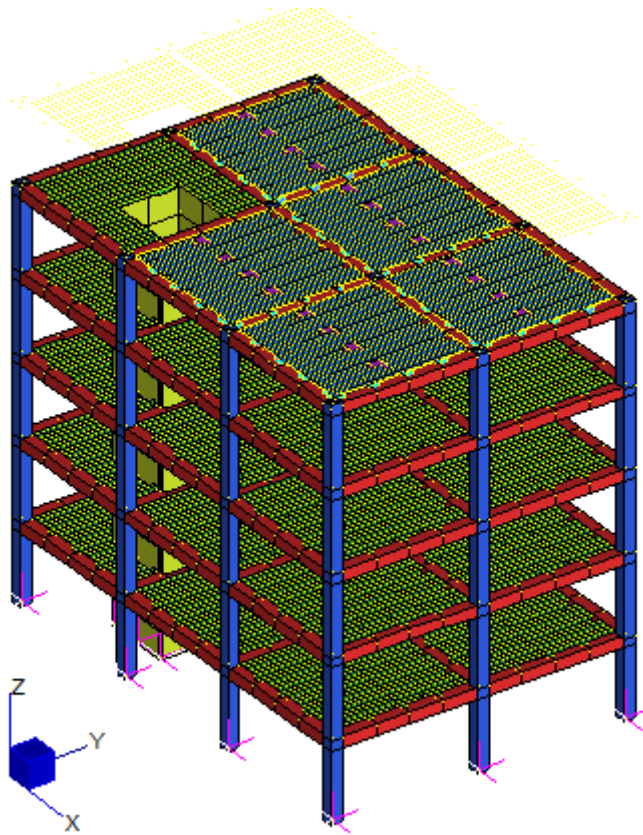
FE model of the R/C building with GFRP panels on 5th floor
